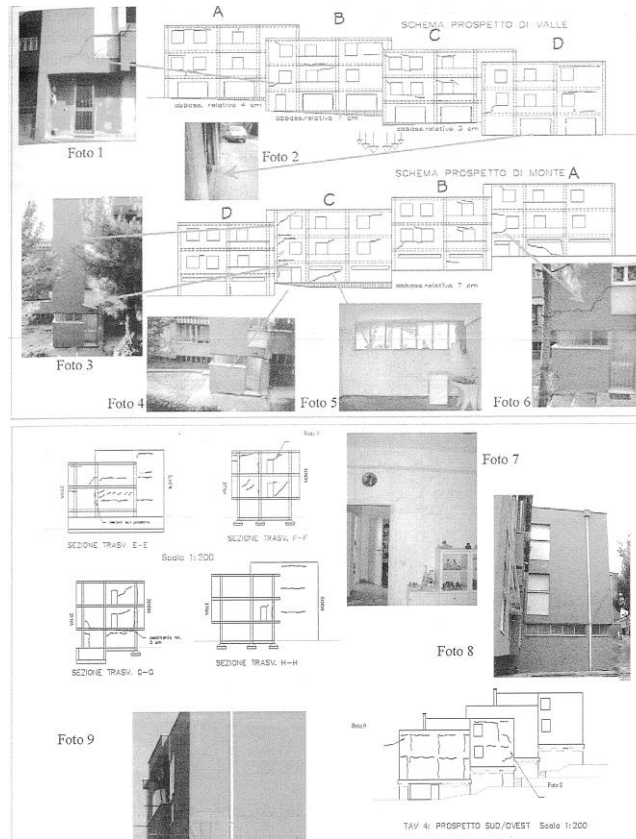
Damage to buildings with prevailing systems of cracks (Fruzzetti and Scarpelli, 2004).
